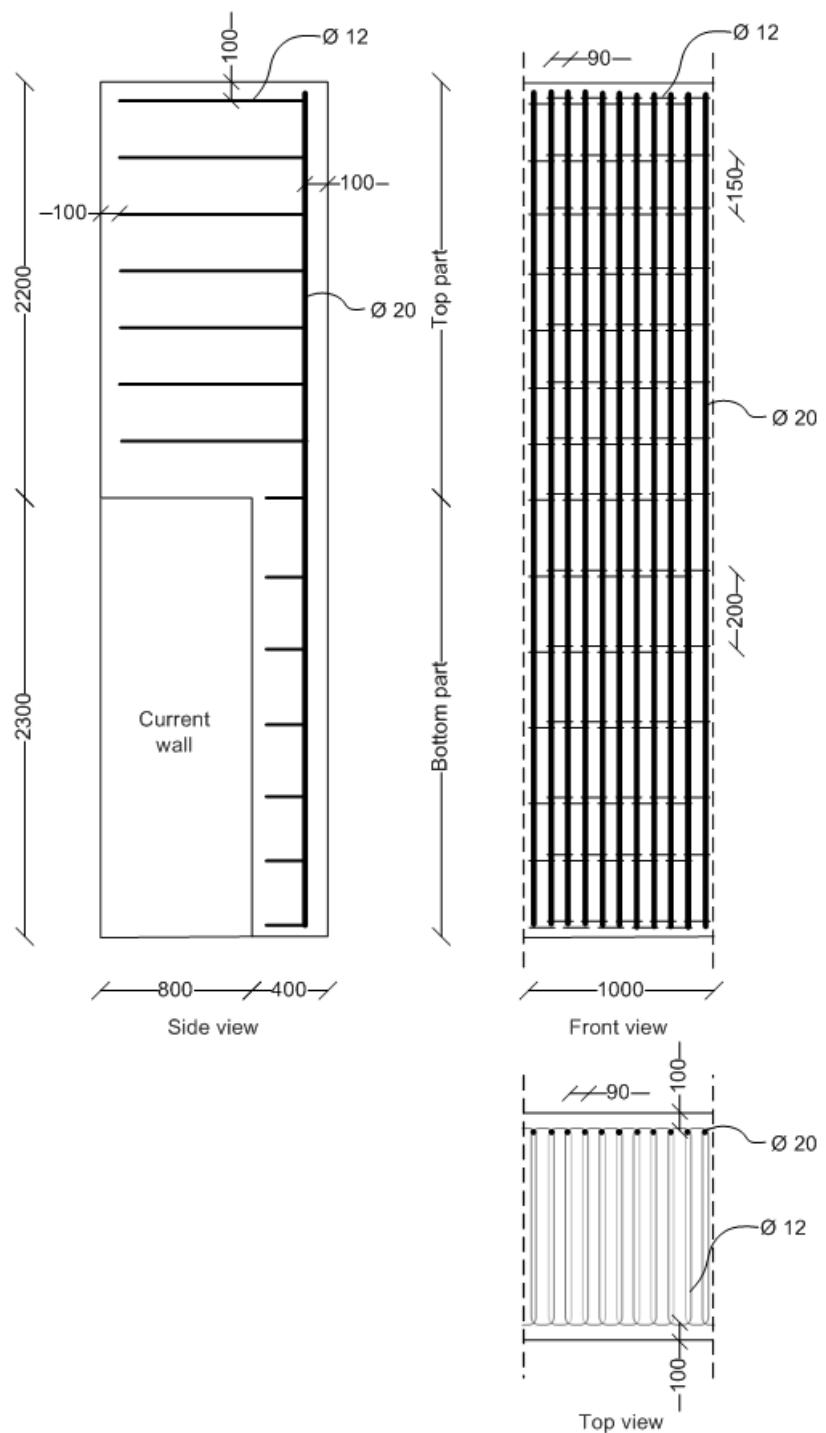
Visualisation of the reinforcement design for the vertical raised wall
